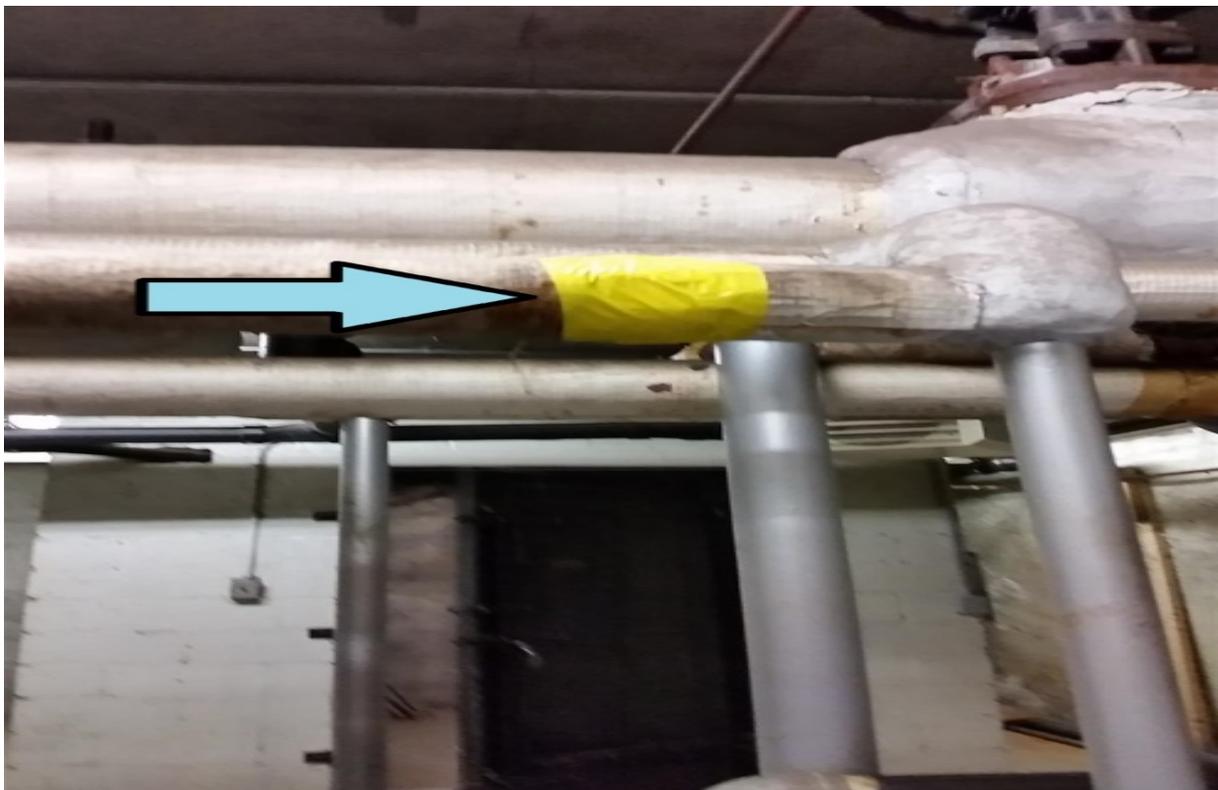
View of sample location of thermal insulating parging cement (grey colour) on steam pipe fitting, in the Basement of the subject building. A bulk sample (BS-FBH-07A) of this material was found to contain 35 % Chrysotile asbestos.
